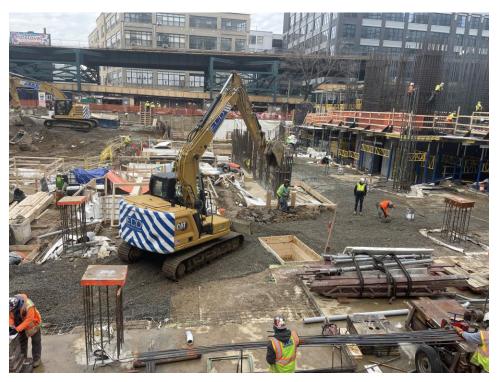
ECD excavating around SOE soldier piles in the central part of the site (WCG J, facing northeast).
